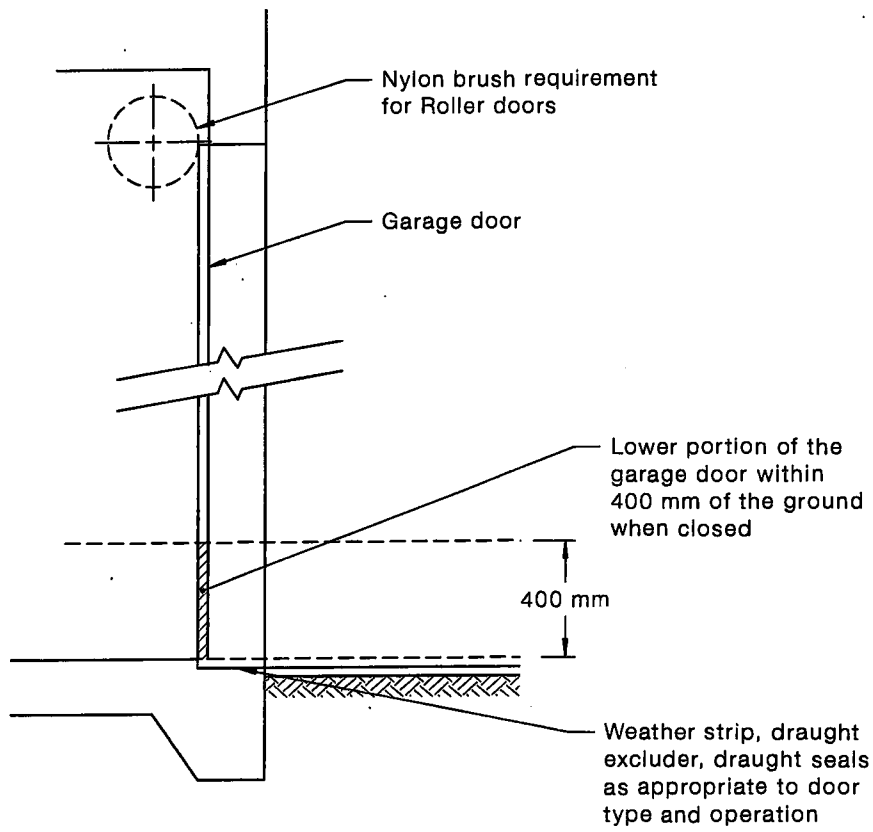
VEHICLE ACCESS DOORS (GARAGE DOORS)
